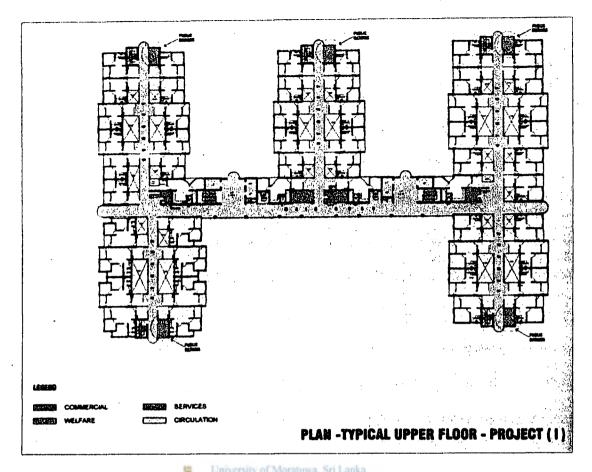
Layout Plan - Sahasrapura Housing Scheme (Not to a Scale)
